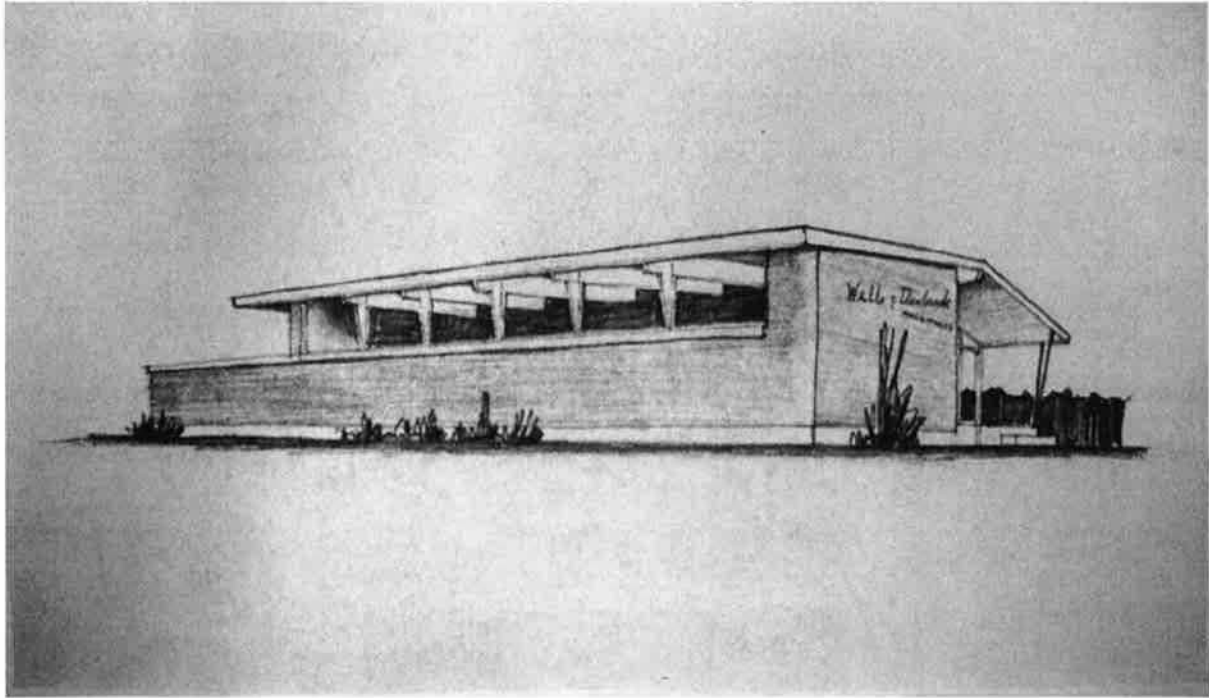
Wells-Denbrook Architectural Office architect's sketch rendering, 1964
